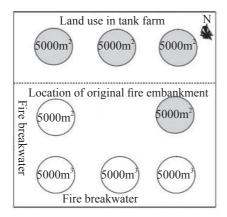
Flammable Liquid Storage Tank Group Arrangement Plan A
